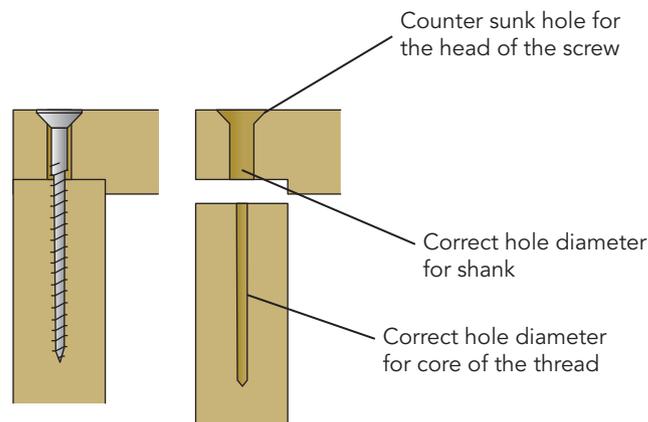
Showing the correct method of drilling clearance holes when screwing
